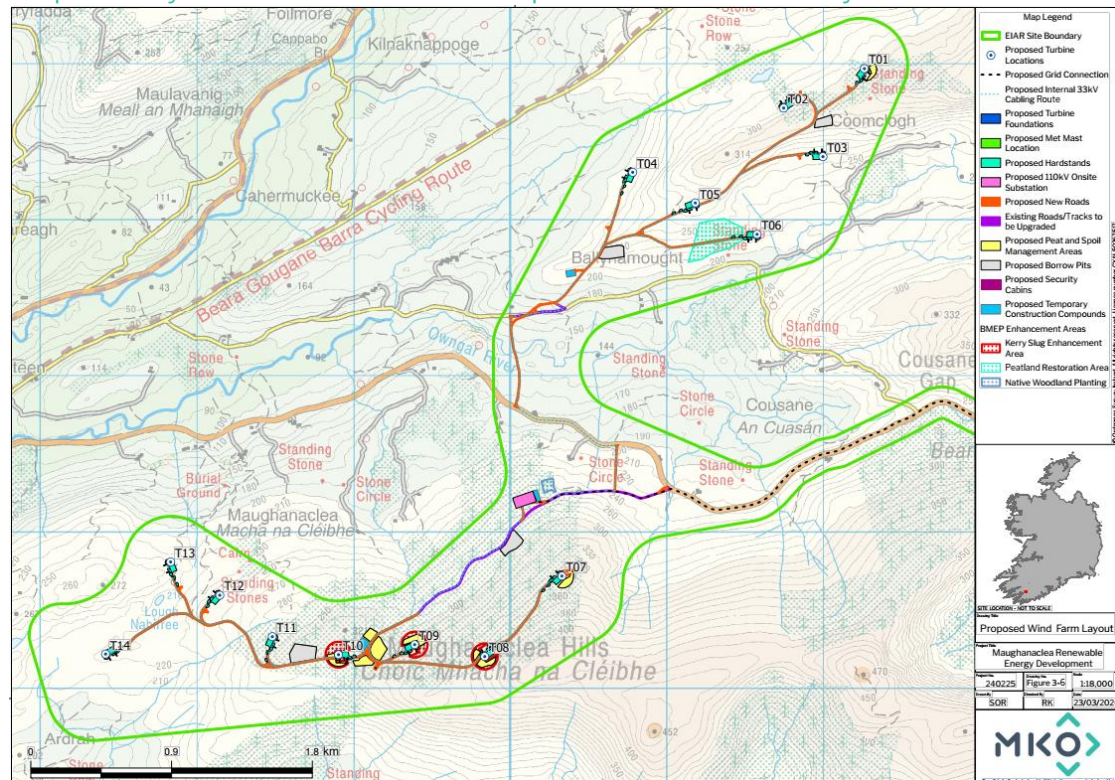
Proposed Layout Iteration No. 4 - Final Proposed Wind Farm site Layout
